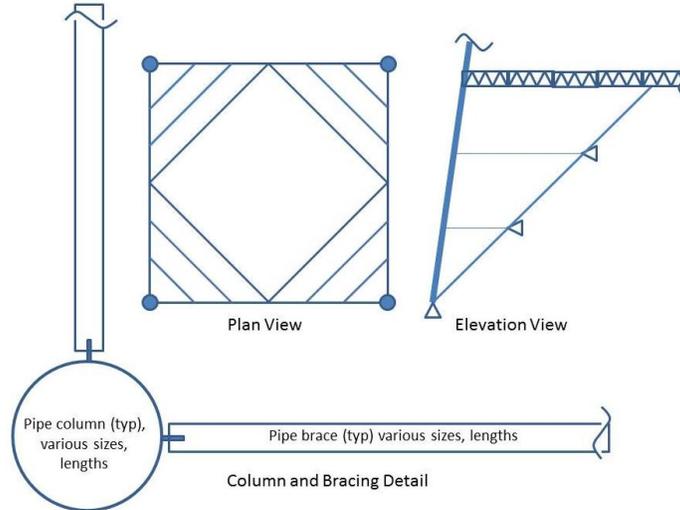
General Column and Bracing Detail, Plan and Elevation Views
